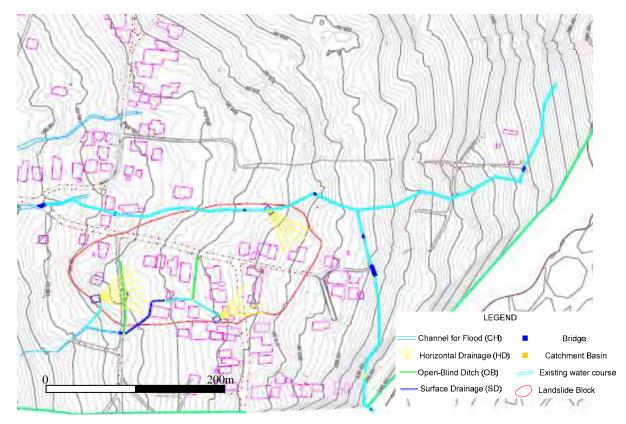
Plan of Countermeasure Works in Block A (source: JET)
